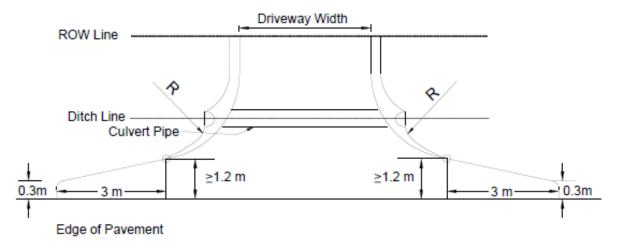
Typical Design Elements of a Field and/or Farm Driveway
